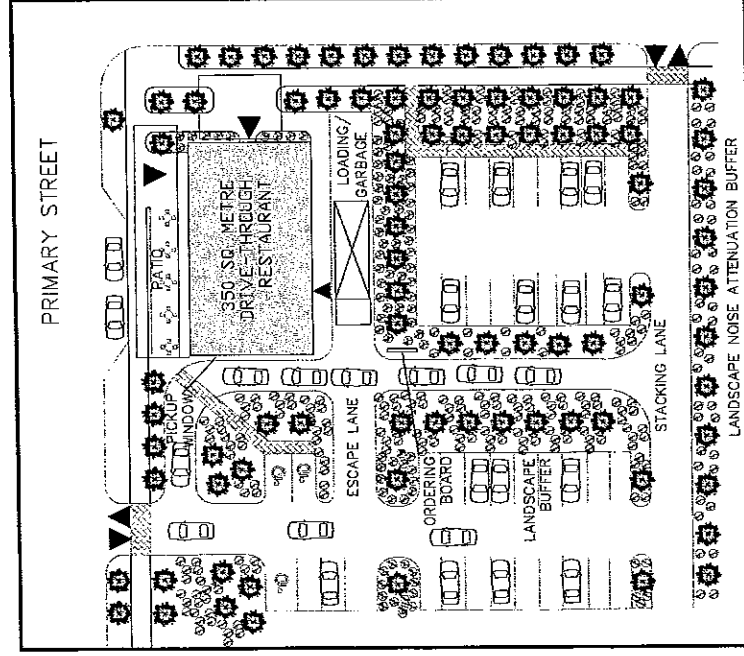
Plan of street-oriented building with patio and direct pedestrian access from street
